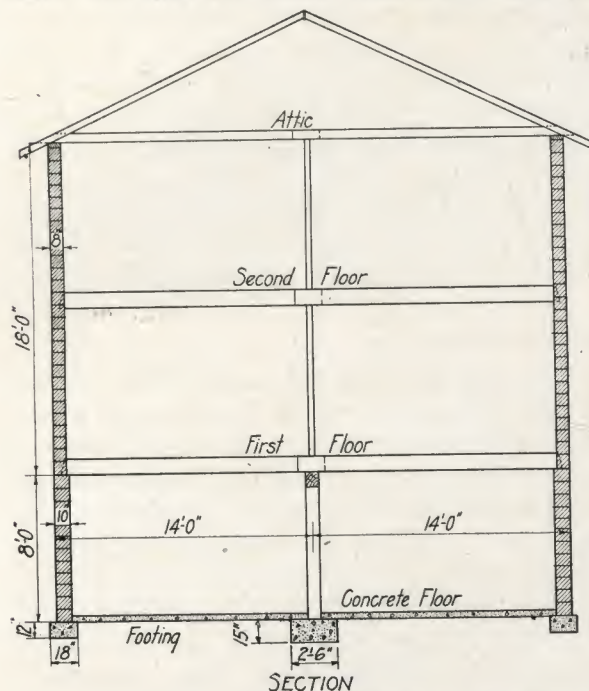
Sketches for determining size of footings for houses built of concrete units.
